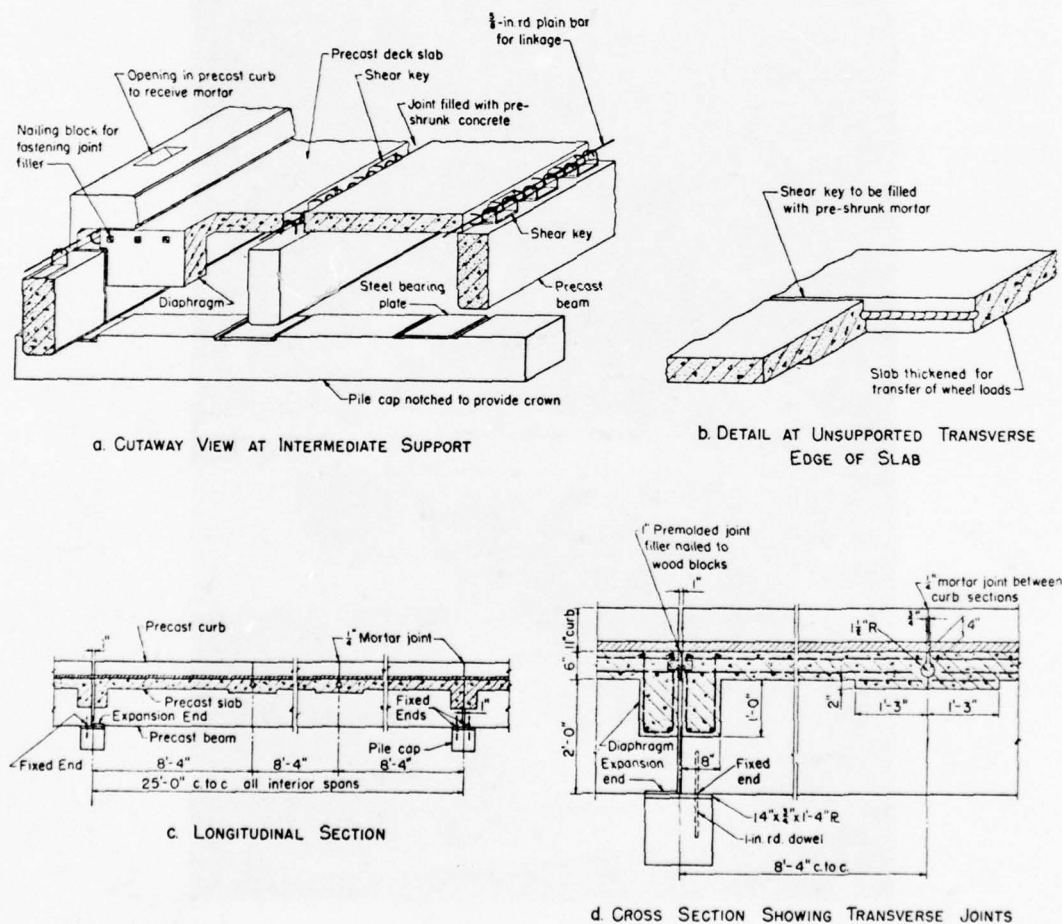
Bridge deck of precast beams and slabs (courtesy of Portland Cement Association)
